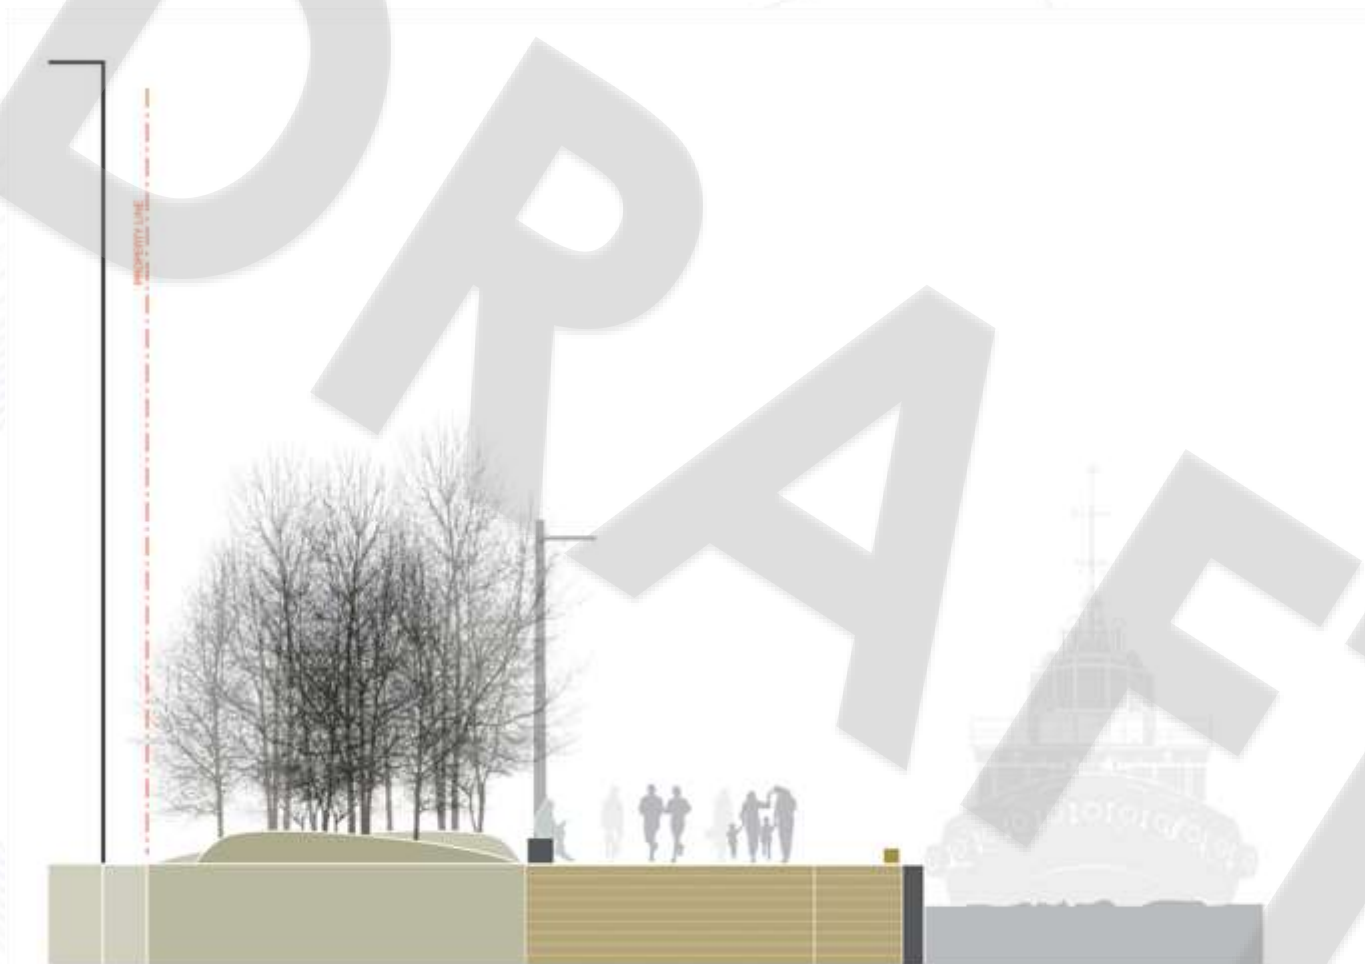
Proposed typical water's edge promenade section facing the Ship Channel.
